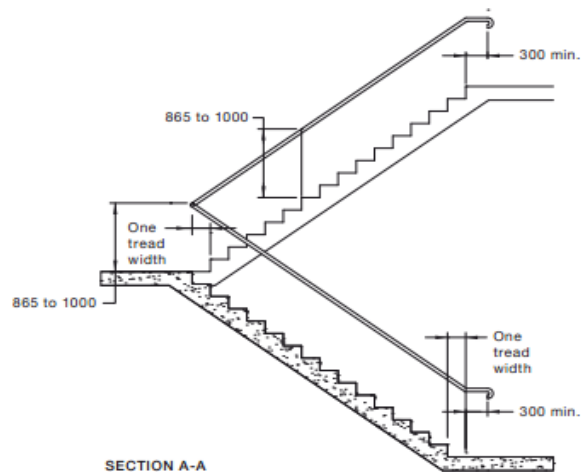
(B) STAIRWAY LOCATION AND HANDRAIL EXTENSIONS AT END OF STAIRWAY OTHER THAN AT LINE OF BOUNDARY
